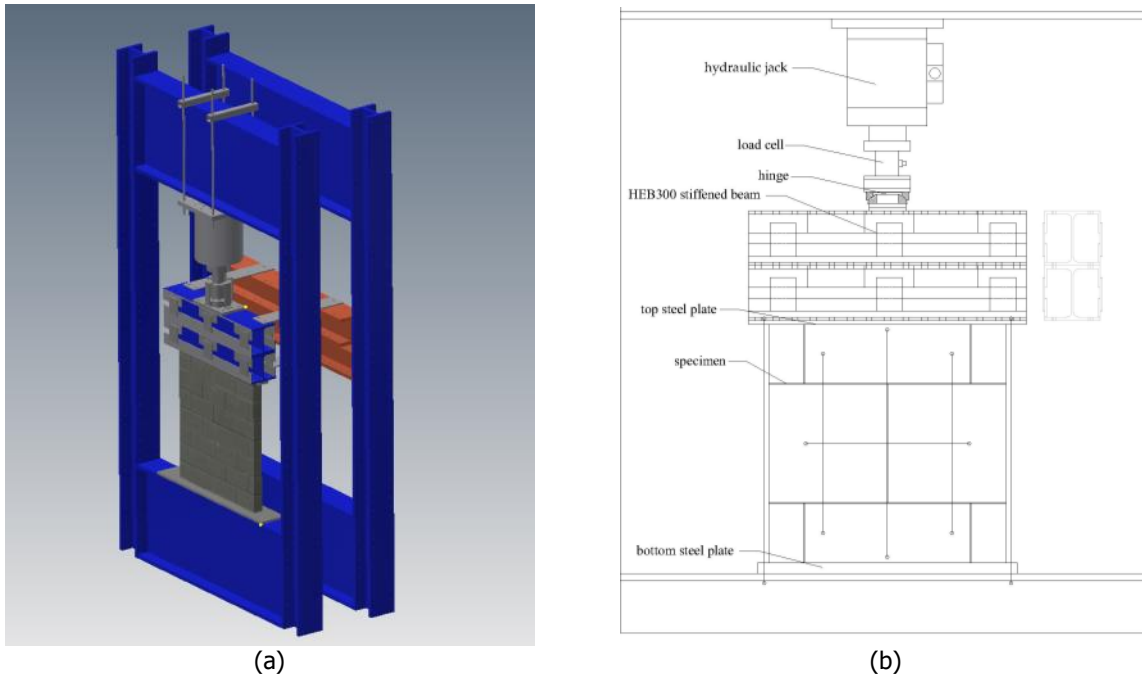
Test setup: (a) 3D model; (b) drawing.
